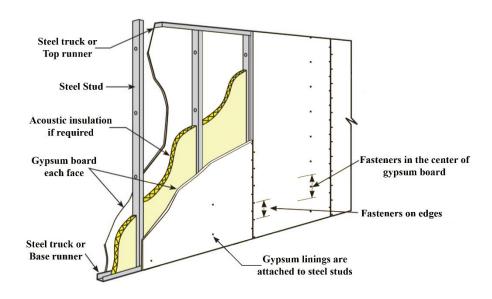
The elements of a light-gauge steel-frame gypsum board partition walls (Adopted from Building & Construction Authority Publication)
